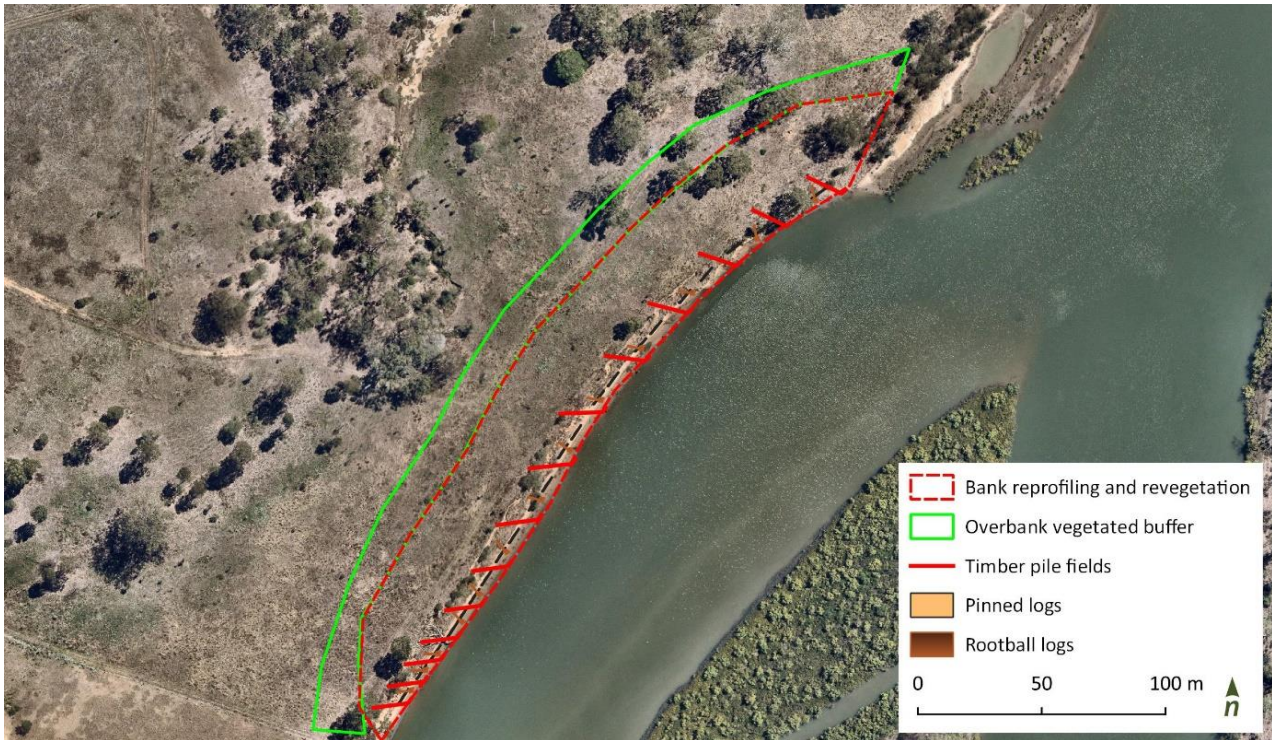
Conceptual site layout of potential streambank stabilisation works at Site D - Calliope River
